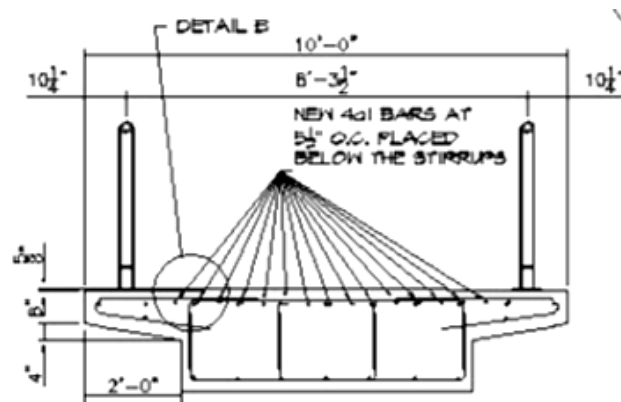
Cross Section of the Test Bridge Deck Near the Pier
